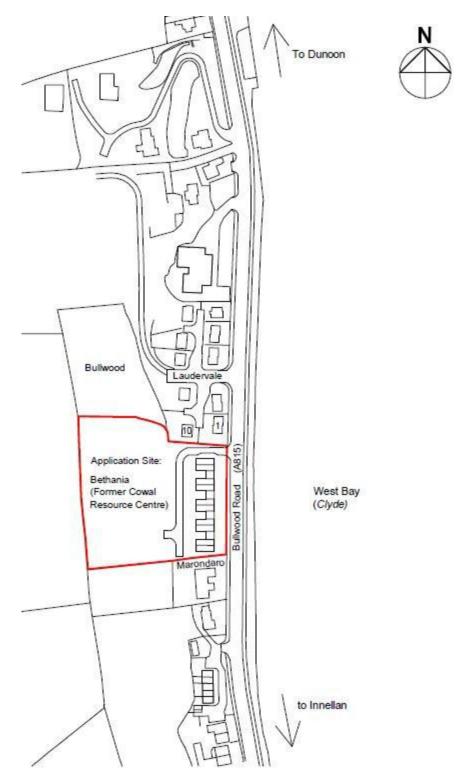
Location Plan of the Dunoon Passive House (source: Fyne Homes)
